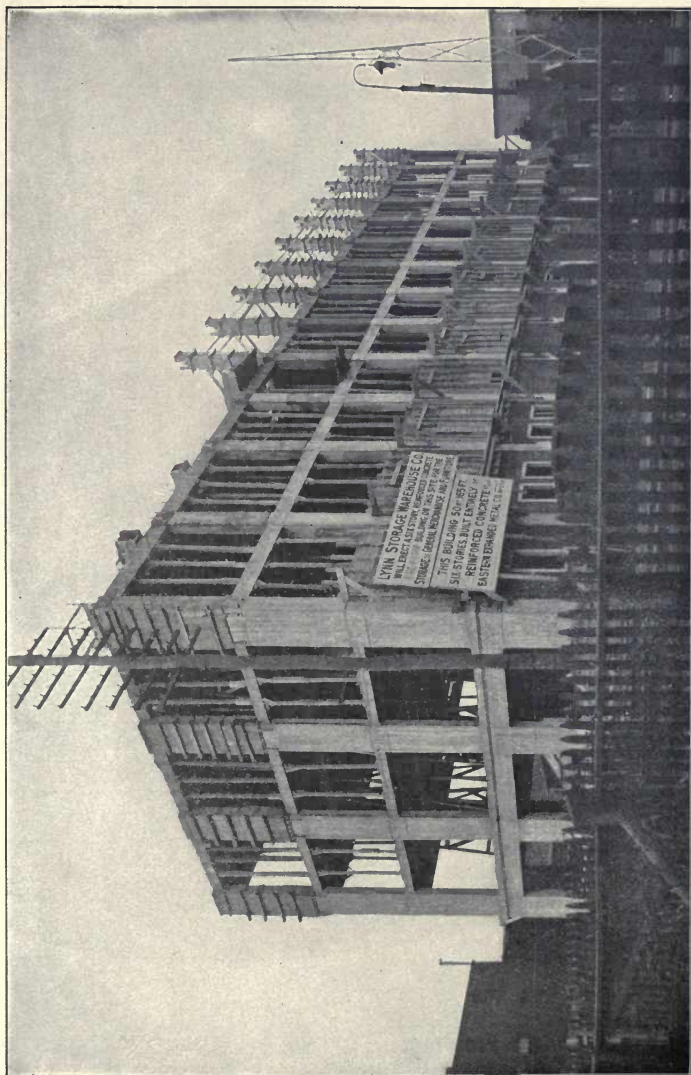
Lynn Storage Warehouse at Fifth Floor Level. (See p. 82.)
